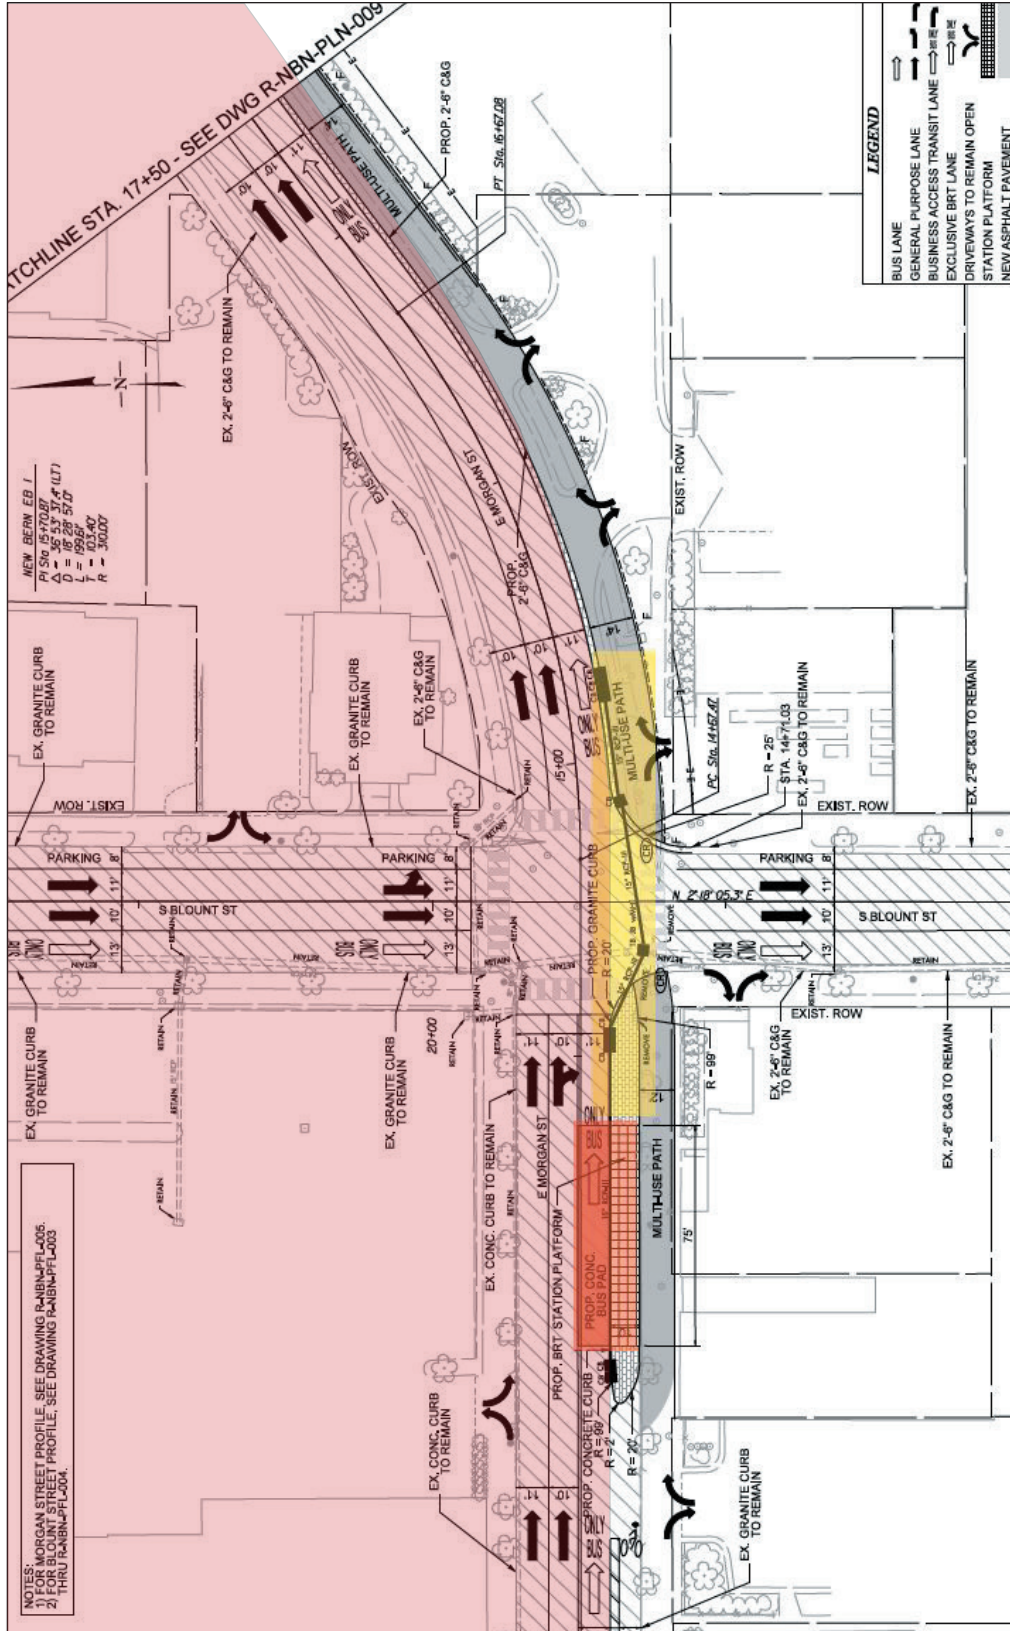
Capitol Area Historic District (red) and the South Blount/East Morgan Street Stop, Wake BRT New Bern Corridor Preliminary Plans, Sheet R-NBN-028, 2020
